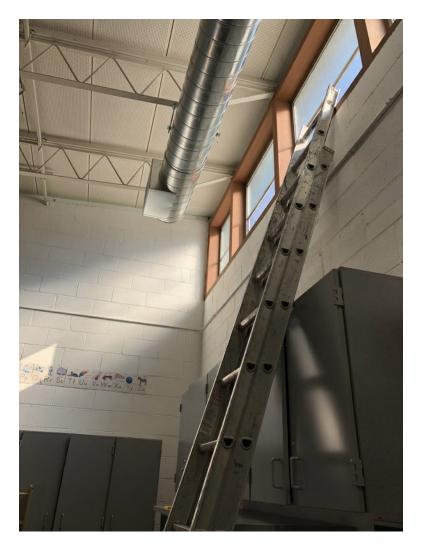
East Wall of Multipurpose Area with High Band of Windows, Wood King Posts, and Joist Bridging to North Exterior Wall
